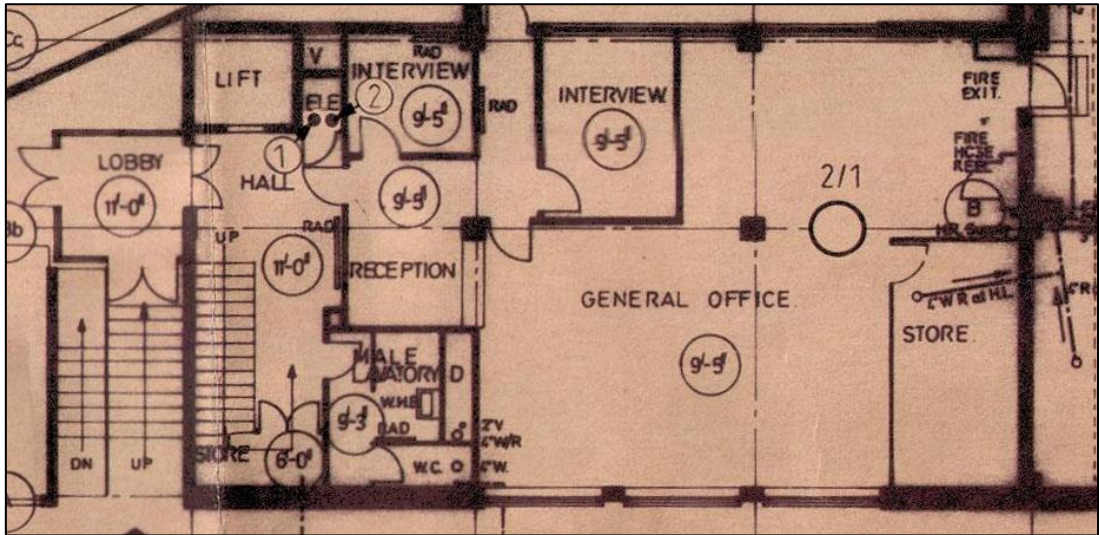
A 1984 ground floor plan of the eight-storey tower block (Chief Engineer's Office, Metropolitan Police)
